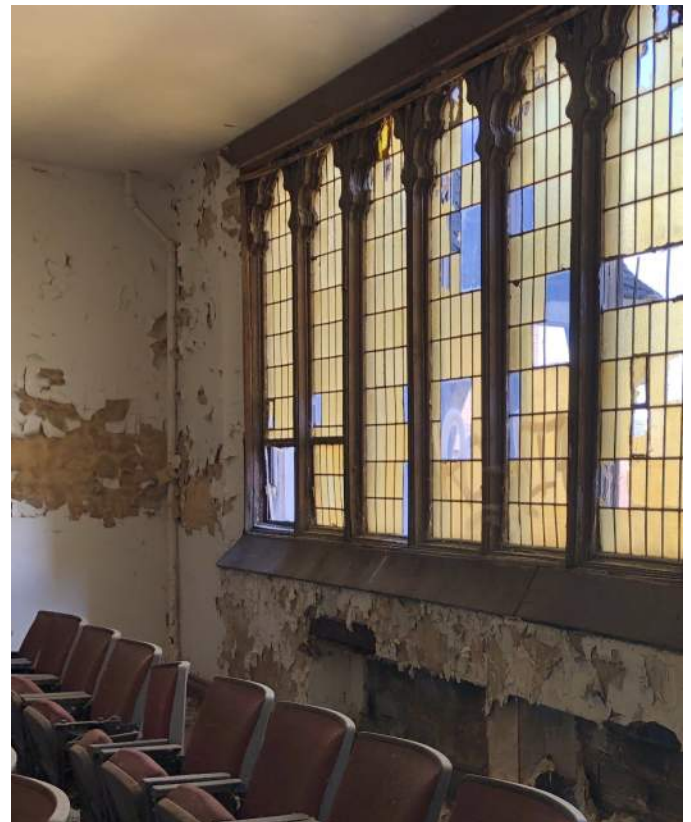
FALLEN OR MISSING WINDOWS; DETERIORATED MASONRY WALLS AND DEBRIS
